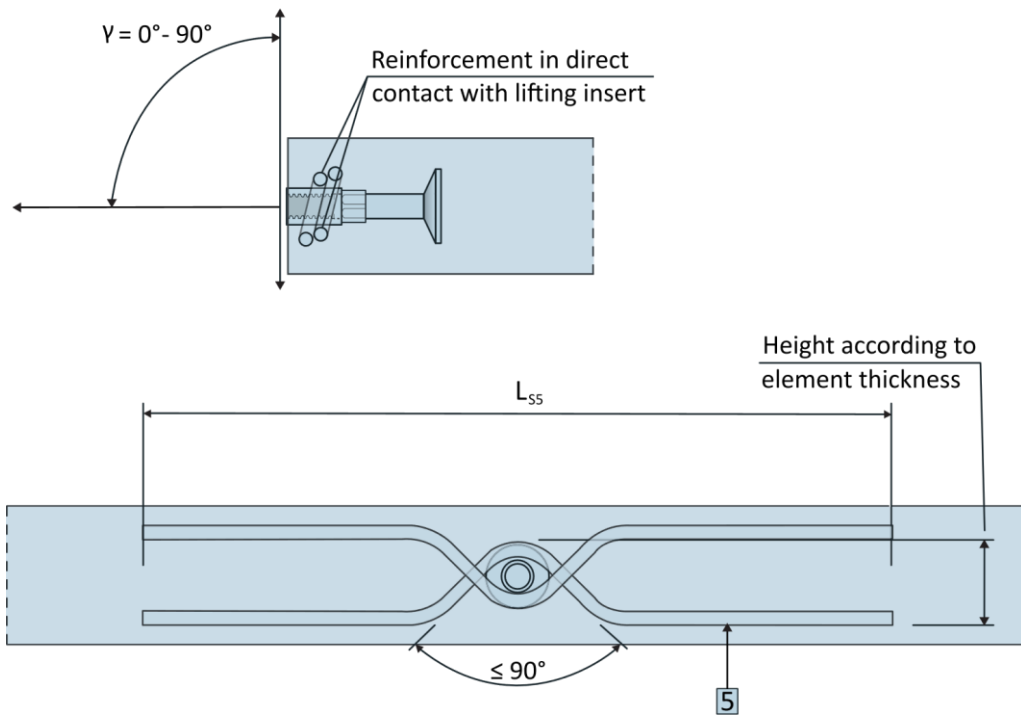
R lifting anchor tilting reinforcement, lifting force both directions
